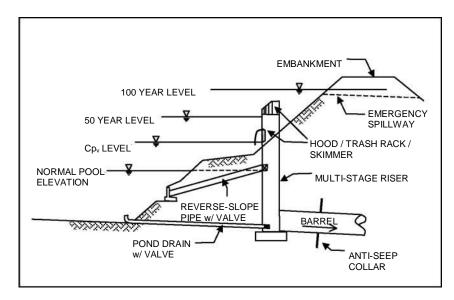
Typical Wetland Facility Outlet Structure
